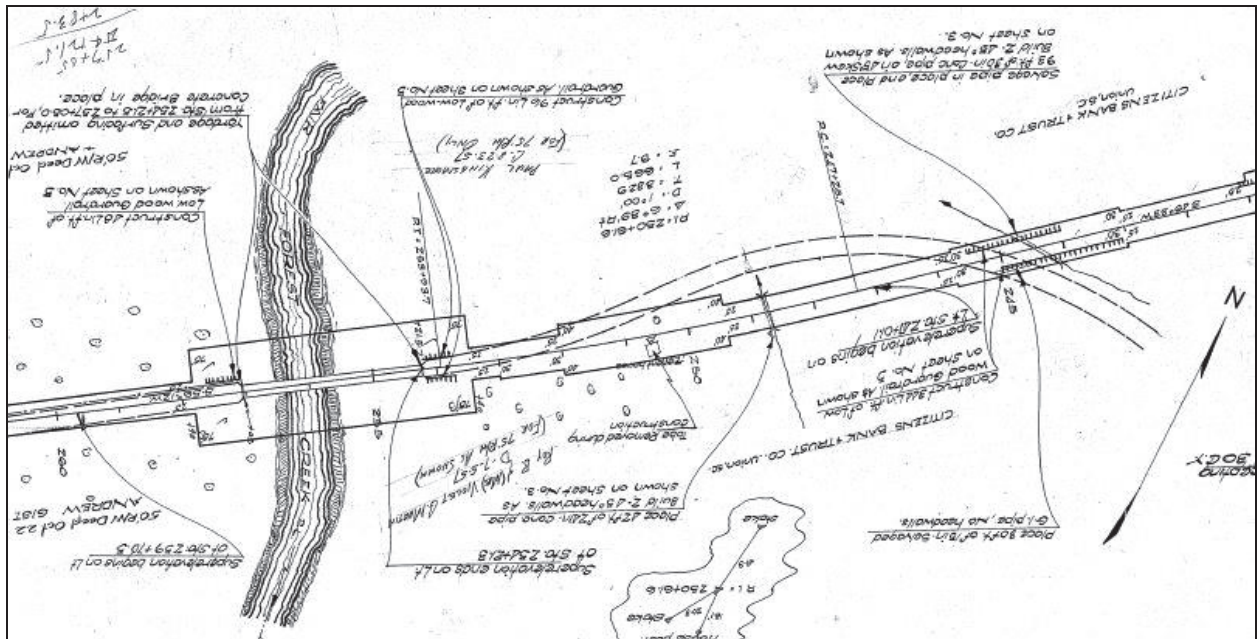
Portion of the 1929 construction plans showing the old road alignment.
